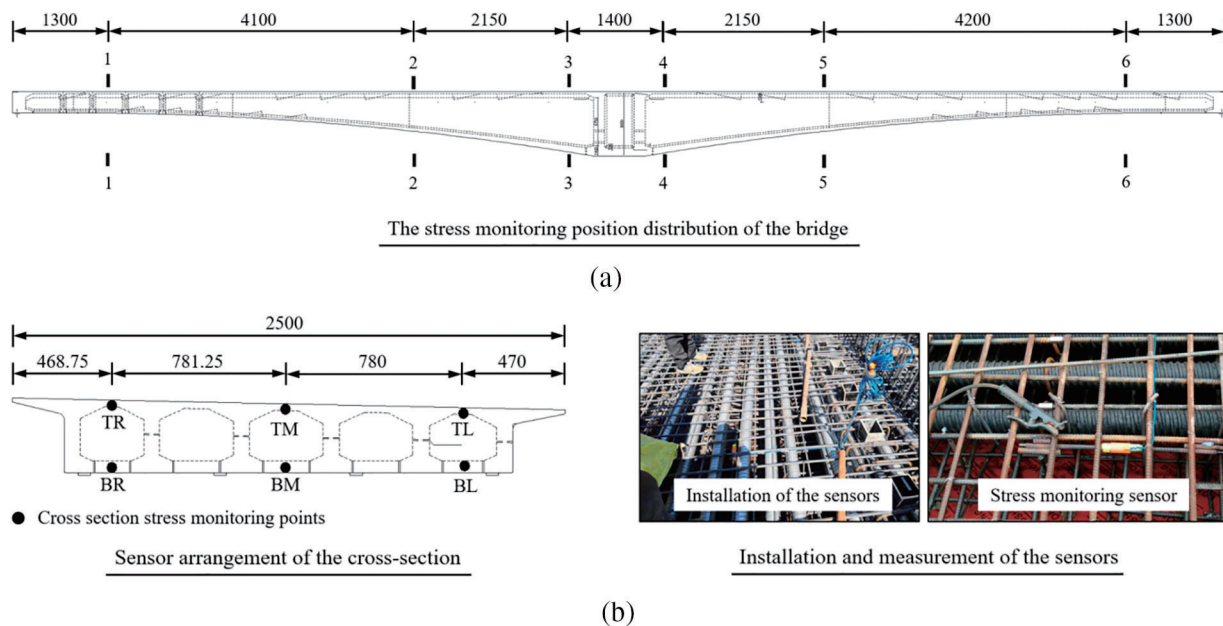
The arrangement of stress measuring points of SG/SF Ramp Bridge: (a) Monitoring section of the whole bridge; (b) The bridge section monitoring points (unit: cm)
